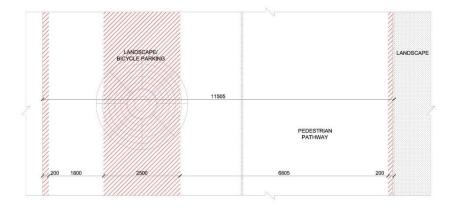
Street width and buffer spaces (in mm) for Gateway 2 in the area surrounding Darmstadt Hauptbahnhof
